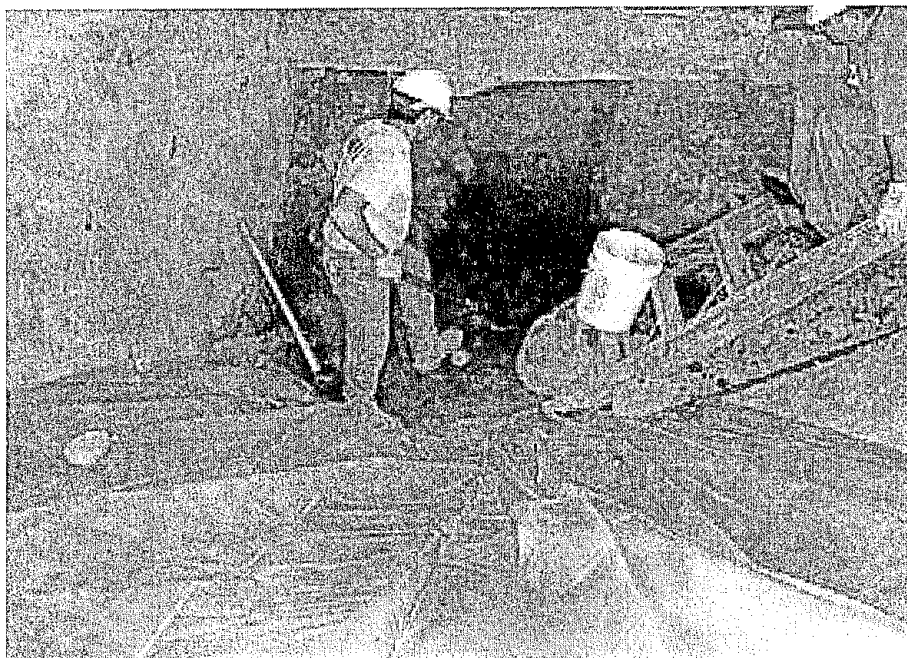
Photograph below shows the final depth on the excavation along the interior western wall of the Chromium Room. In the center of the photograph a wooden bridge can be seen. This bridge was constructed to move equipment and personal in/out of the Chromium Room and over the excavation, which extends the entire length of the western wall. Also seen in the photograph is the hose to the confined space blower, which stream a continuous flow of fresh air into the Chromium Room. In addition the ladder was placed in the excavation for emergence exits, as required OSHA.
